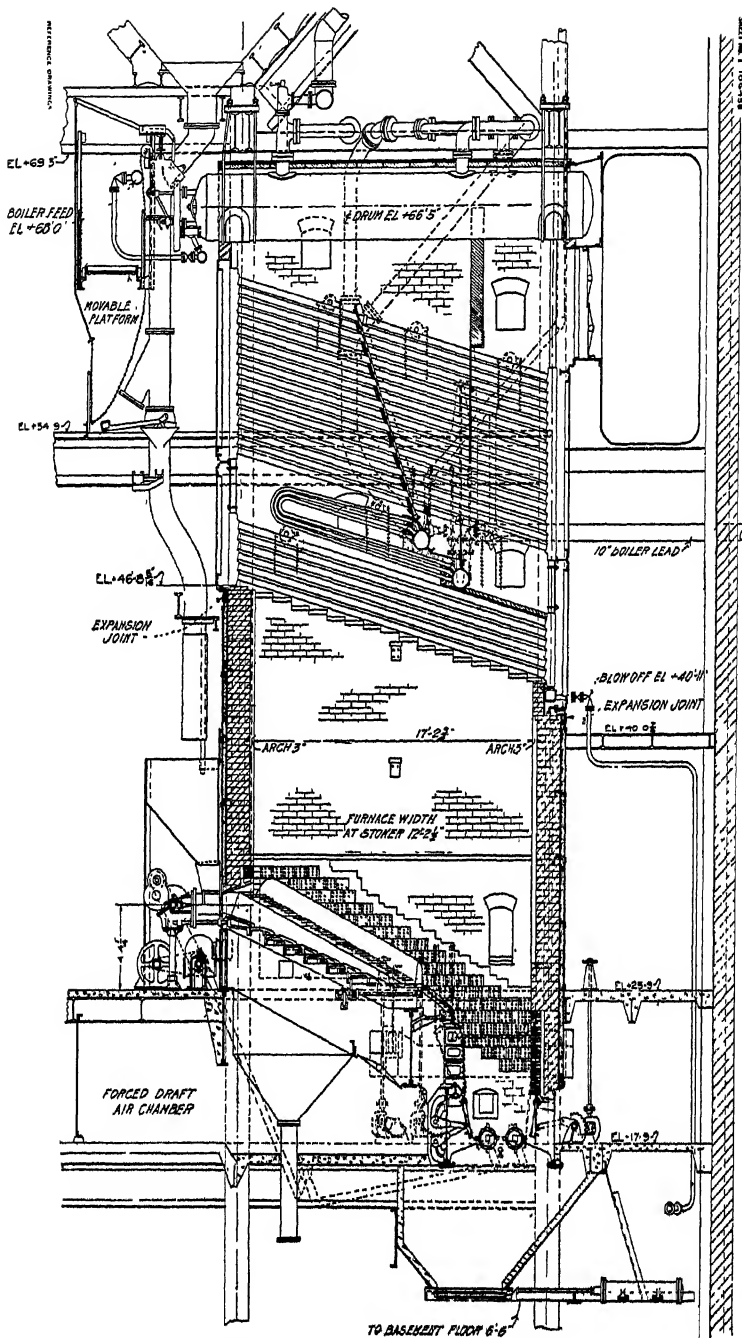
CROSS-SECTION OF BOILER, STOKER, AND FURNACE
